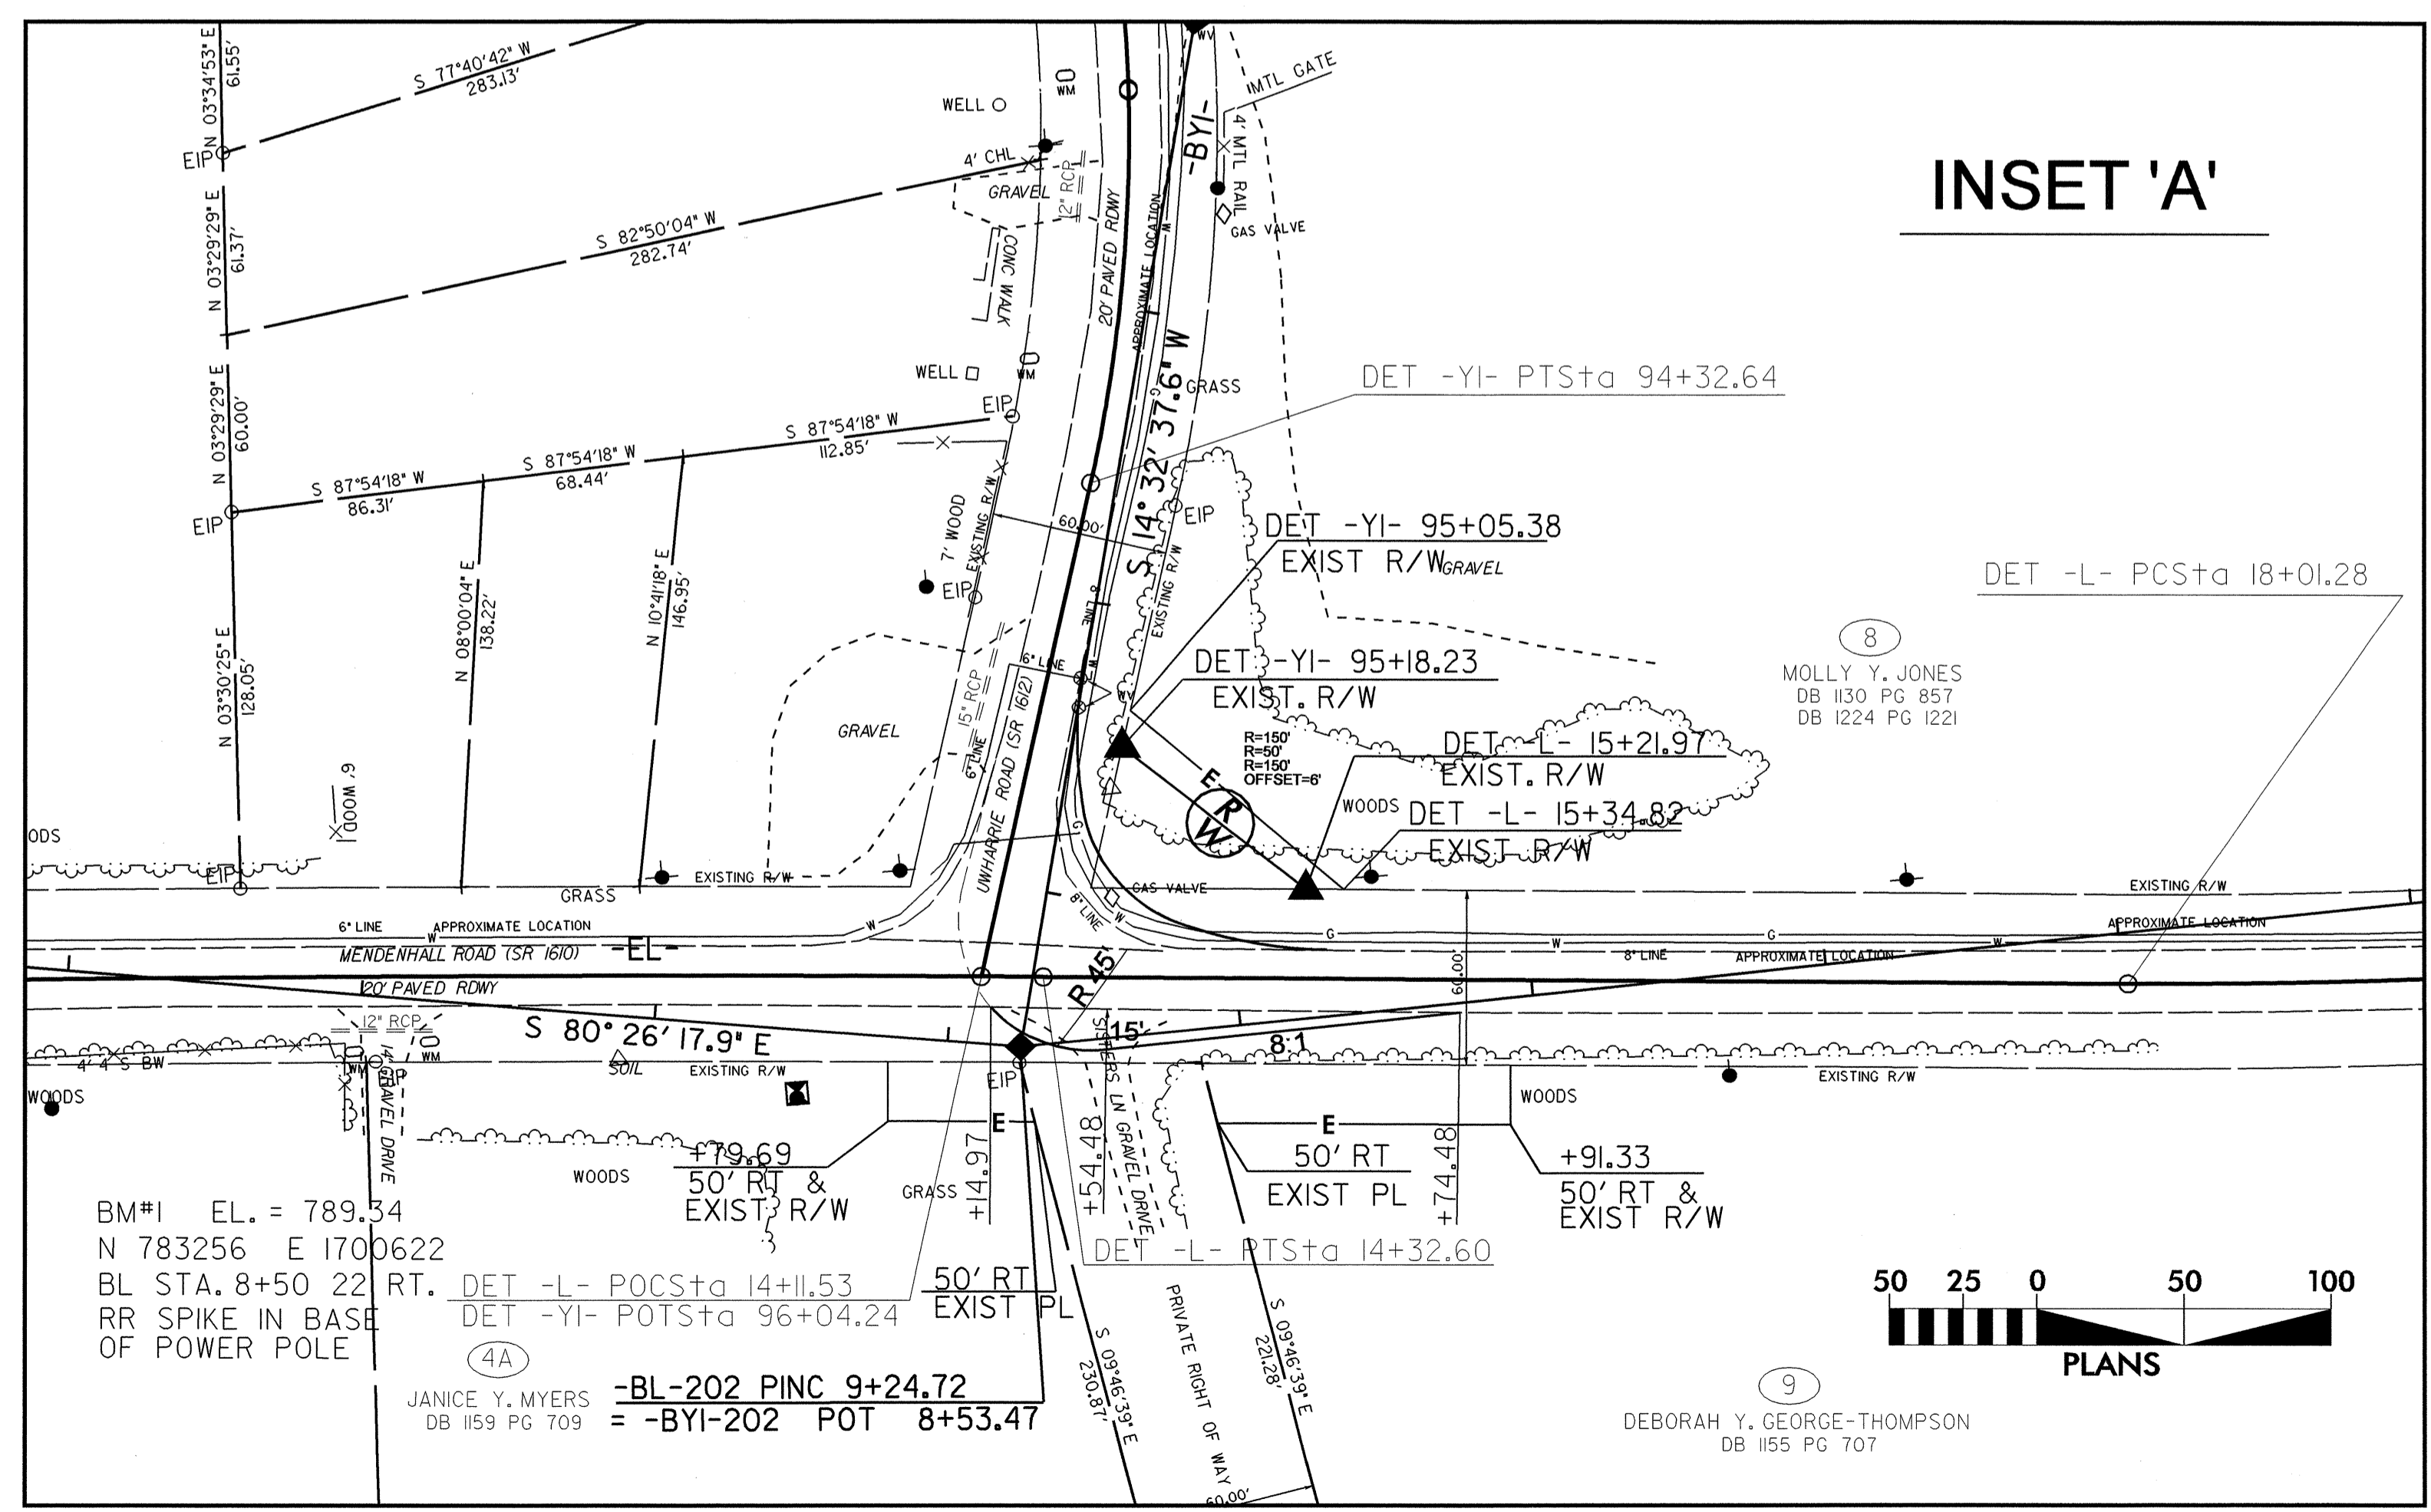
DETAIL SHOWING OFFSITE DETOUR ROUTE IMPROVEMENTS
